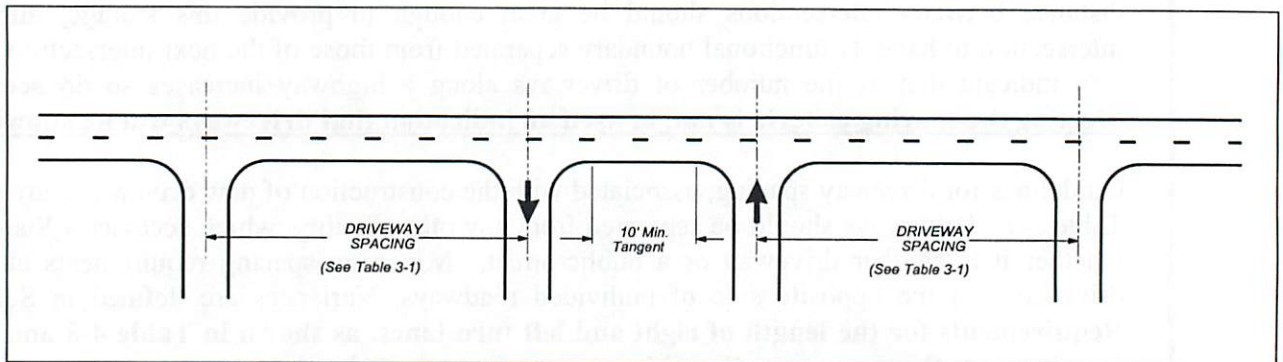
SPACING CRITERIA FOR ONE-WAY DRIVEWAYS
